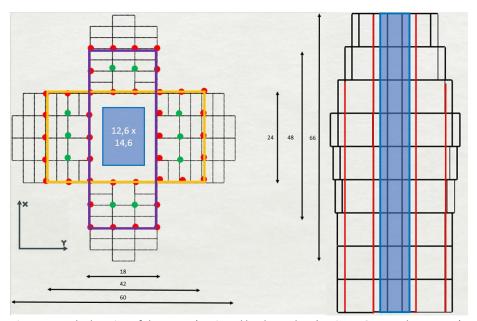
North elevation of the tower (Designed by the authors) Figure 8 Two tube system (Designed by the authors)
